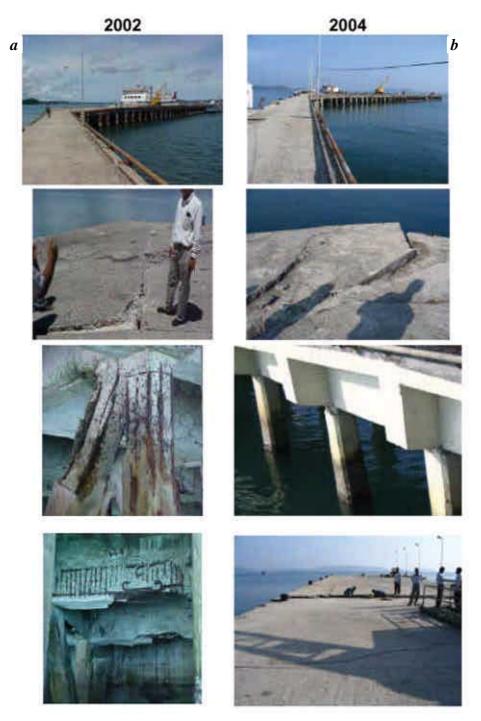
a*, Approach jetty meeting an angle with the main berthing jetty at Diglipur harbour and pounding damage to jetty slab was concentrated at the intersection in the 2002 earthquake. Severe corrosion of reinforcing bars and spalling of cover concrete from beams, columns and batters. *b*, Besides pounding damage of slabs, the old berthing jetty 'sank' and cracked as piles at top failed in shear in the 2004 earthquake.
